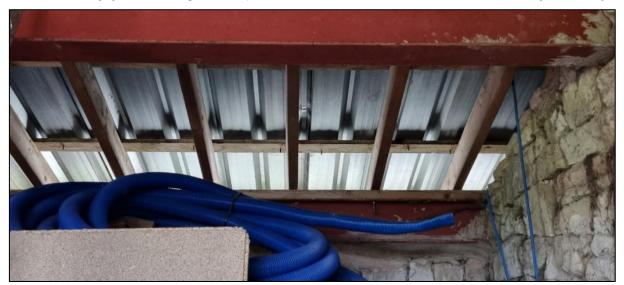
The gaps under the roofing sheets offered unrestricted potential access to the internal space.
